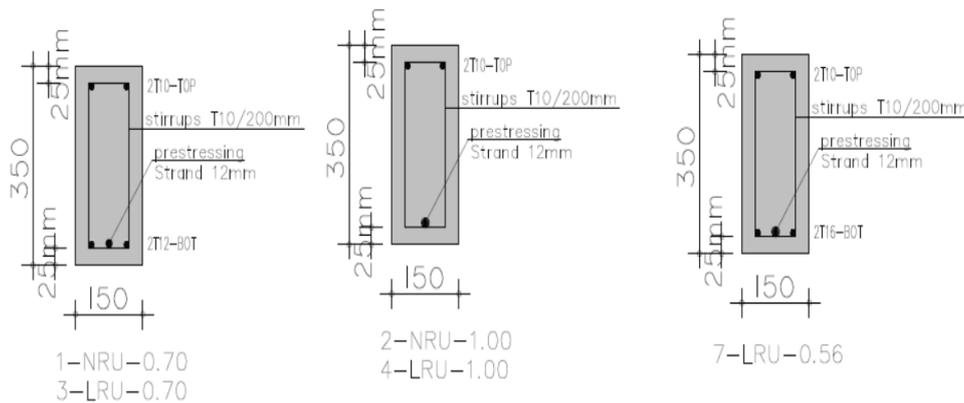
Shows the Rectangular Cross Section for Various Beams.
